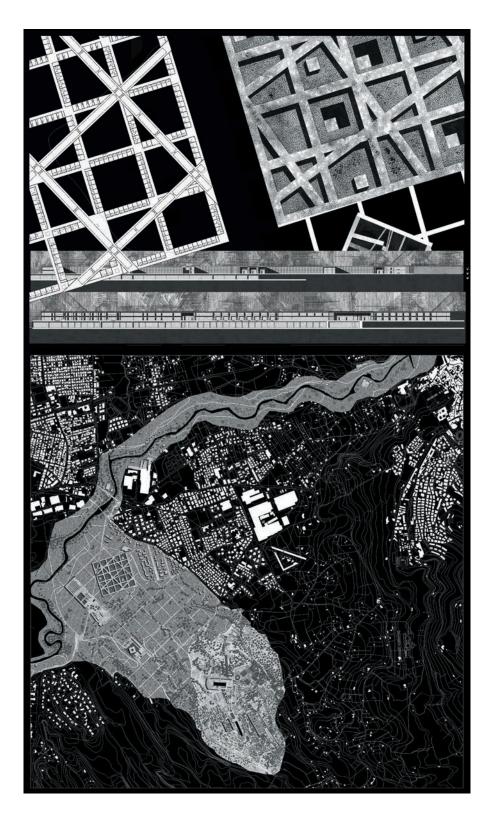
Project A: masterplan, plan and sections of the hotel building; general project master plan.
